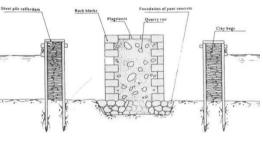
The methods of flooded formwork for Figure 1.16 The methods of watertight formwork piers construction (Source: Franco, 1996)
